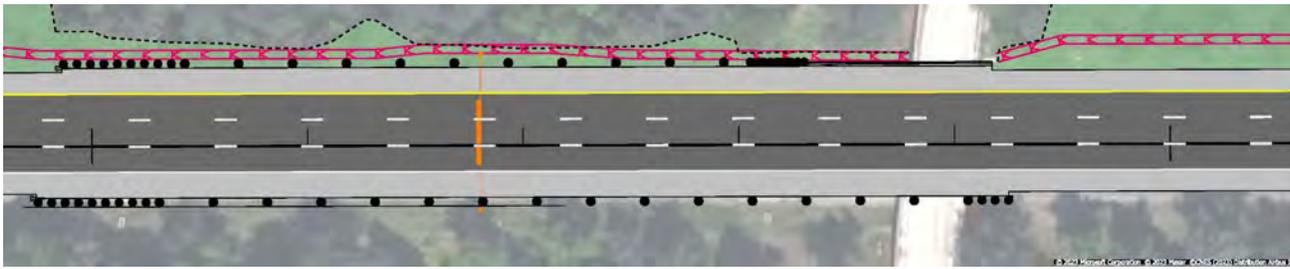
Proposed guardrail has been added along the outside shoulders where existing bridge piers are within the clearzone but beyond the 30' offset which would require BPPS installation.
